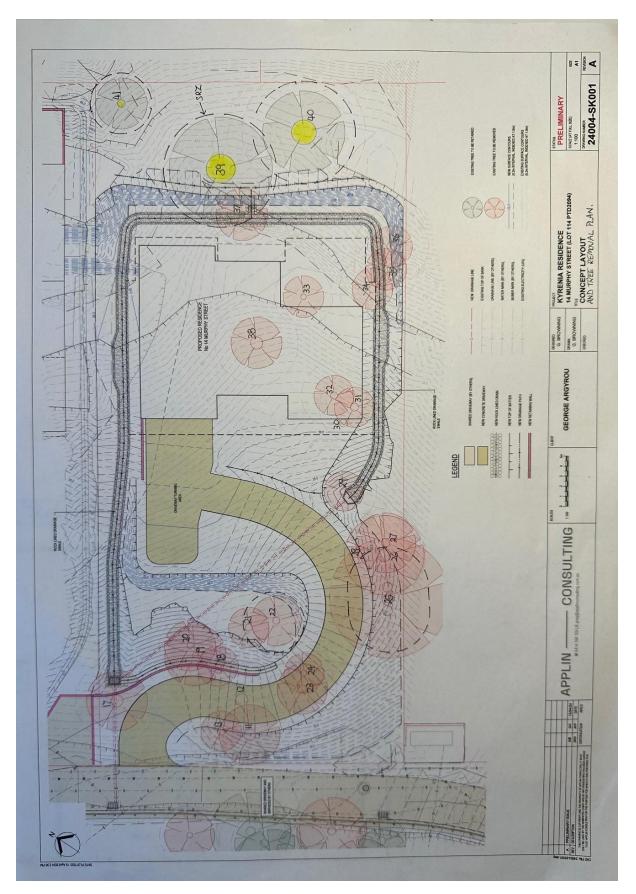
Tree survey plan overlayed on engineered earthworks plan.
